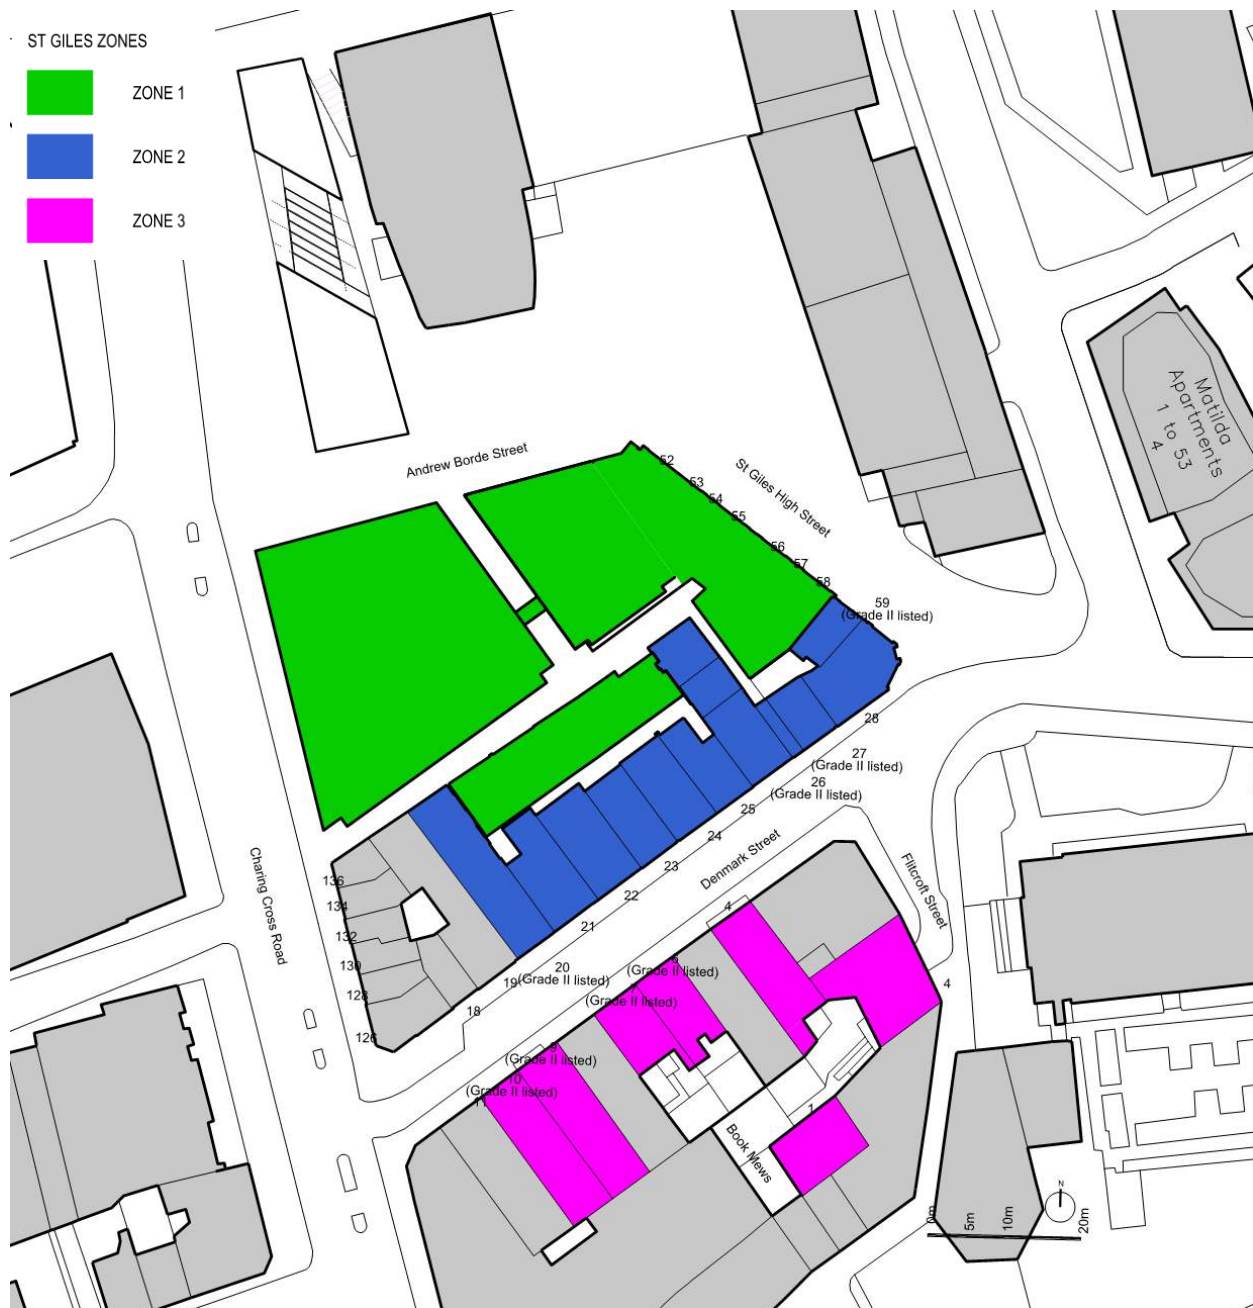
Site plan showing Zones 1 and 2 (North of Denmark Street) and Zone 3 (South of Denmark Street).
